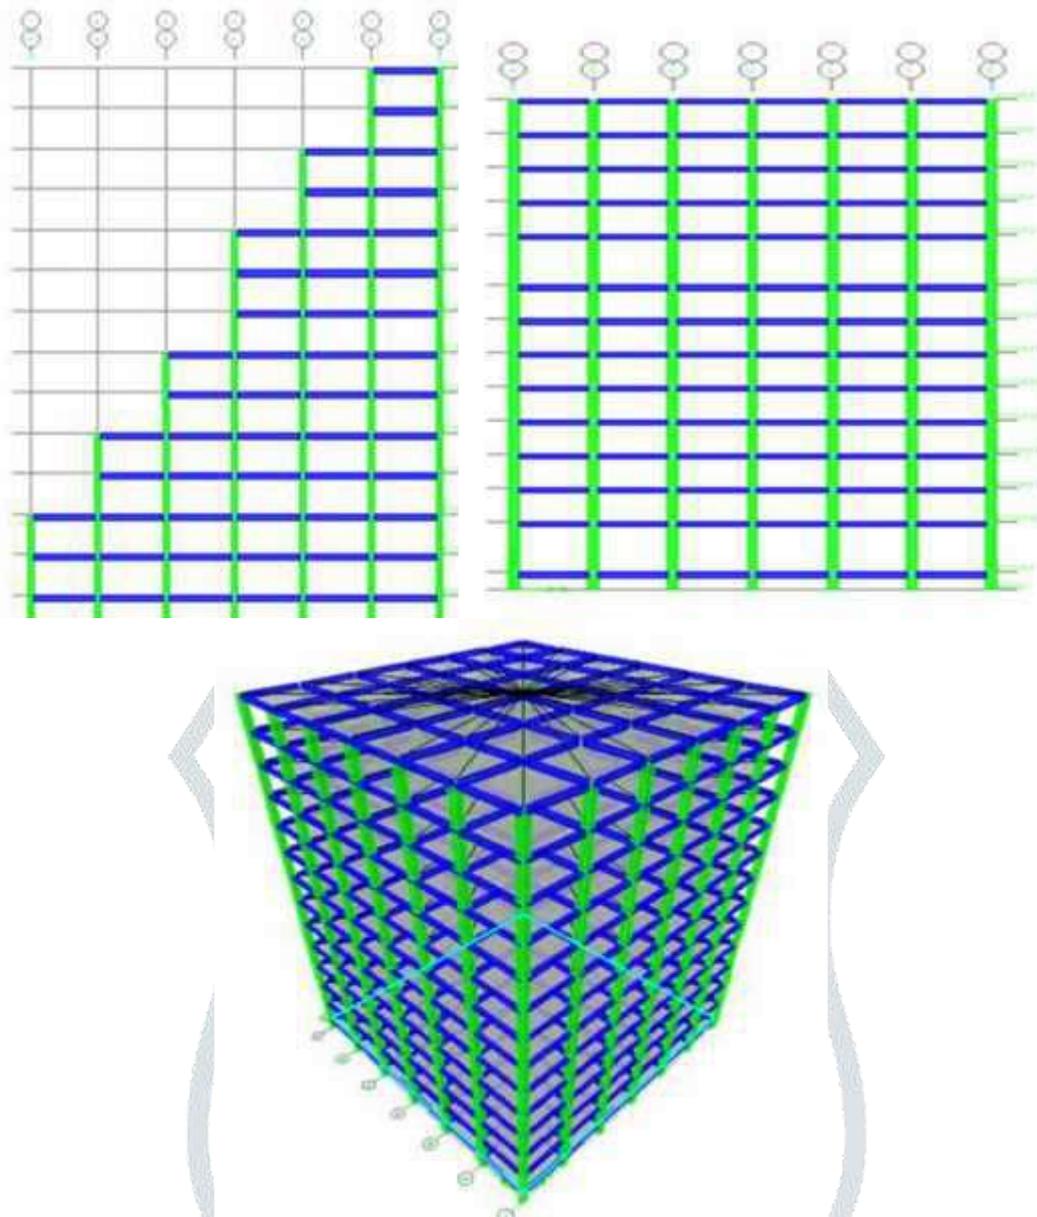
Elevation and 3D View of Vertical Irregular Models (VI-1, VI-2, VI-3)
